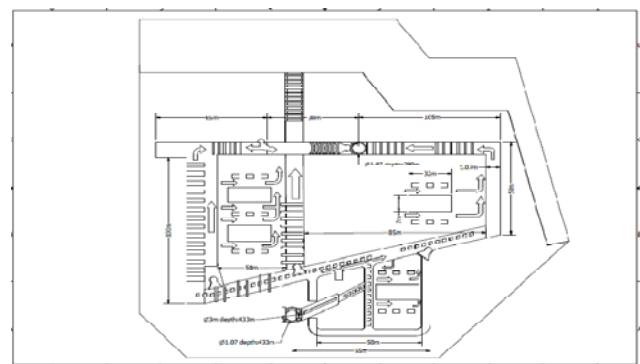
PLAN VIEW OF PROPOSED OKABA UNDERGROUND COAL
